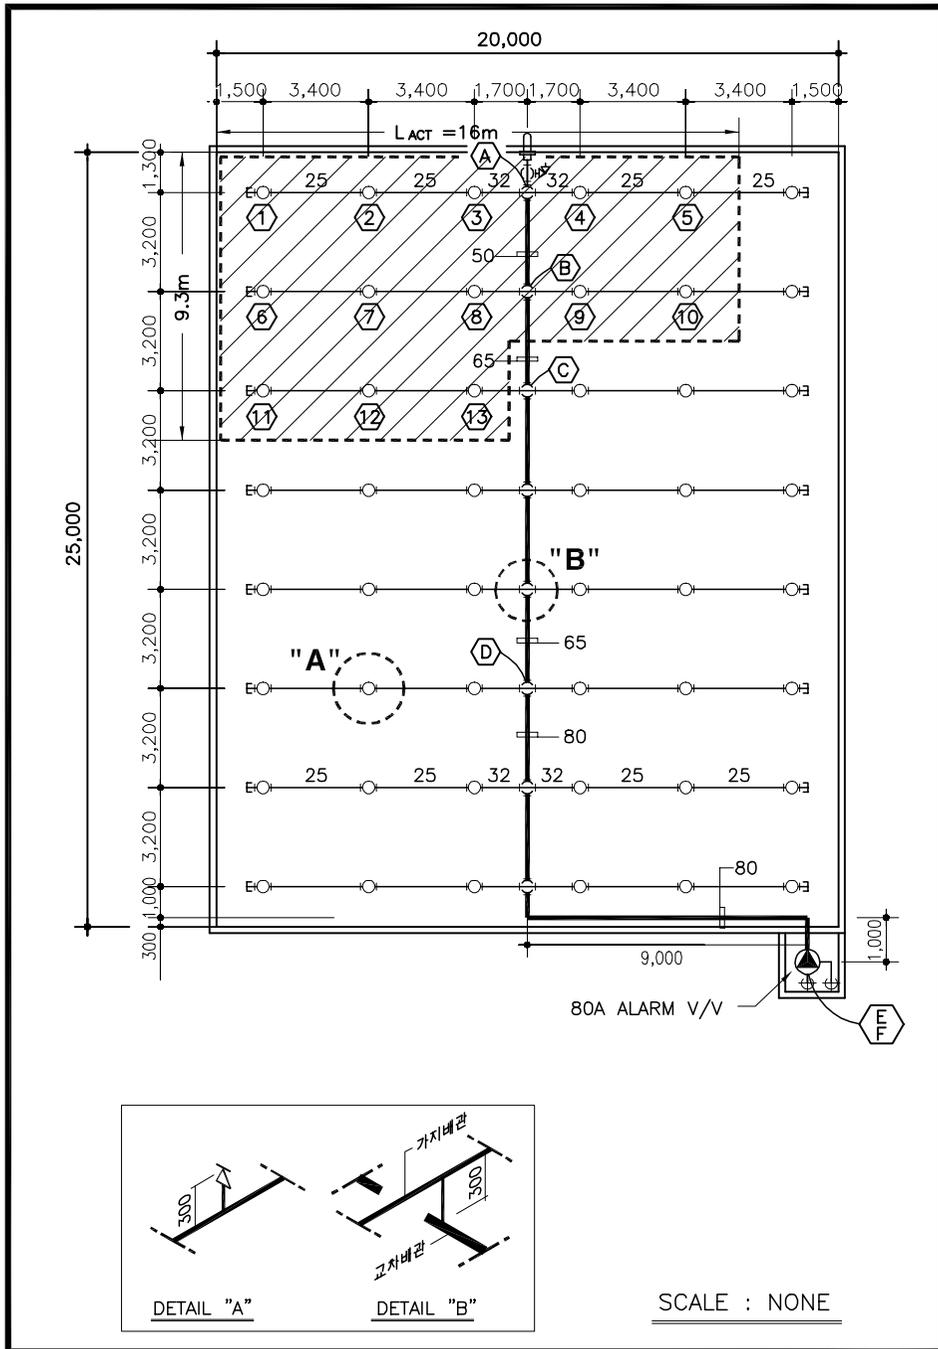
Plan View of Hydraulically calculated Sprinkler System
